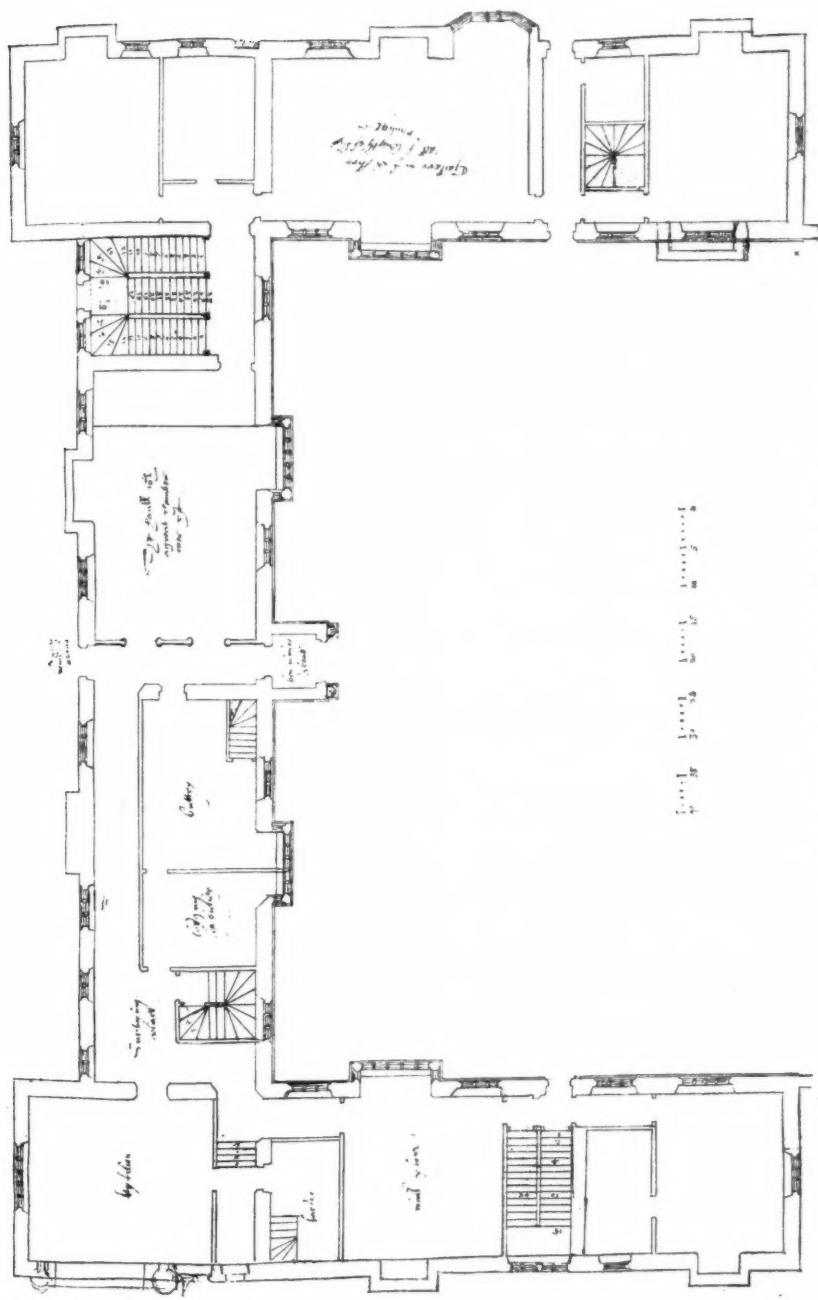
THORPE'S PLAN OF HOUSE FOR HENRY STICKLES.
